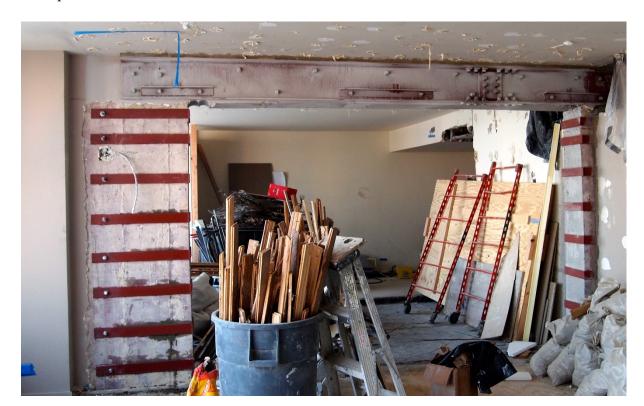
Wall reinformcement with steel strips (UN Plaza, New York)
